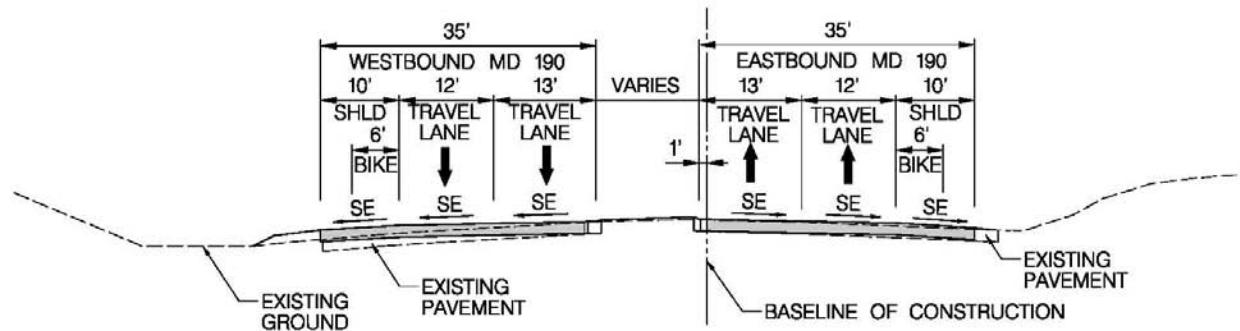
Alternative 1 – MD 190 East and West of Intersection with Pyle Road
